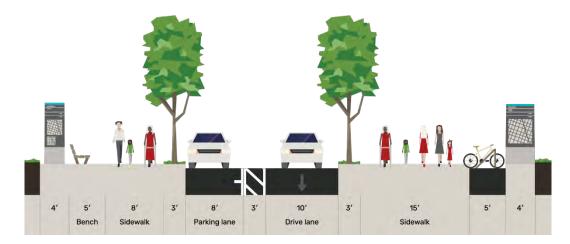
Parallel Parking, Generous Buffers, and One-way Traffic Transect
